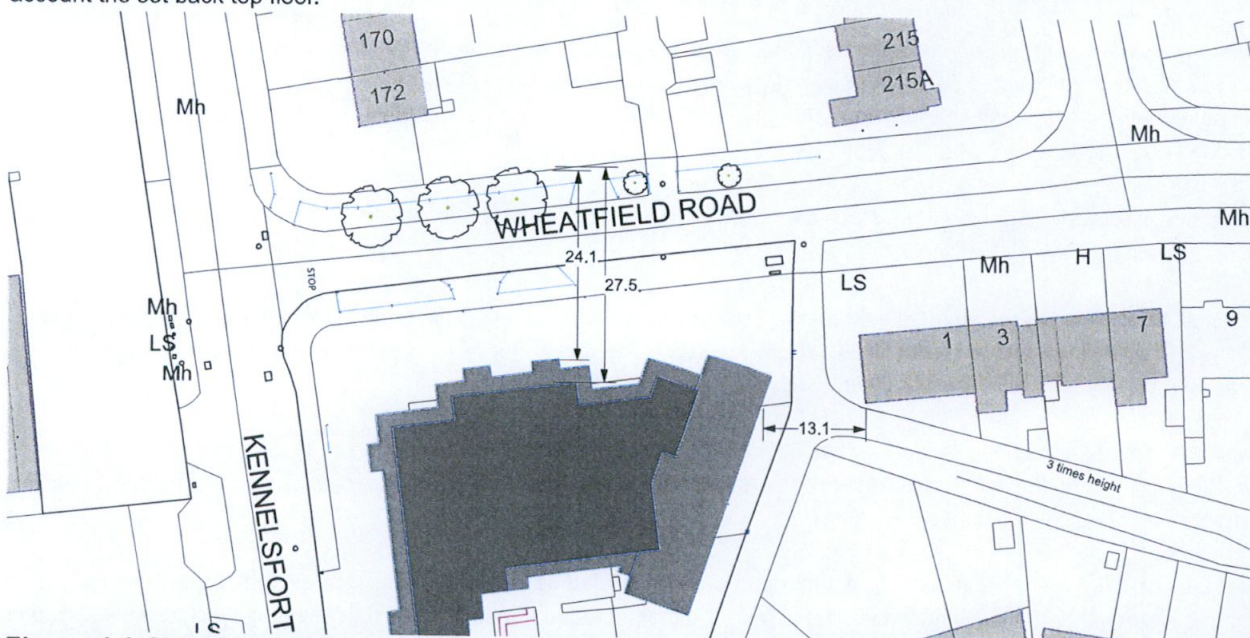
Site Plan indicating the relationship between the proposed development and No.1 Wheatfield Road, 172 Kennelsfort Road and 215A Palmerstown Avenue.
